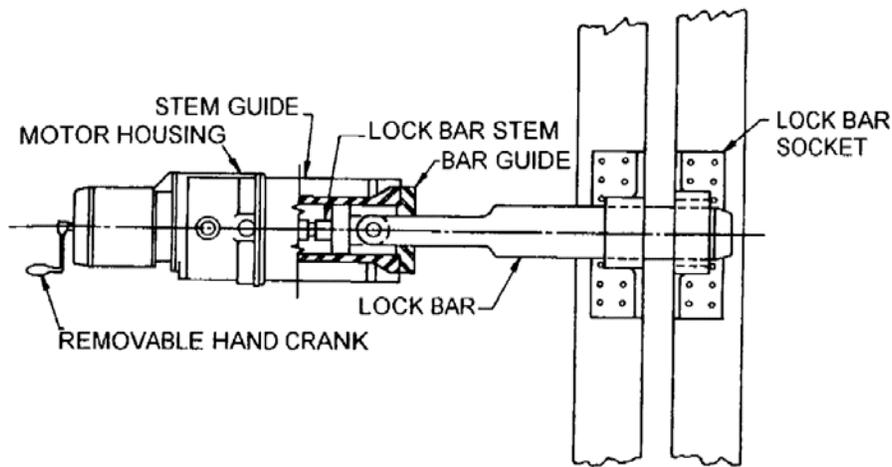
A cutaway view of a self-contained lock bar operator
